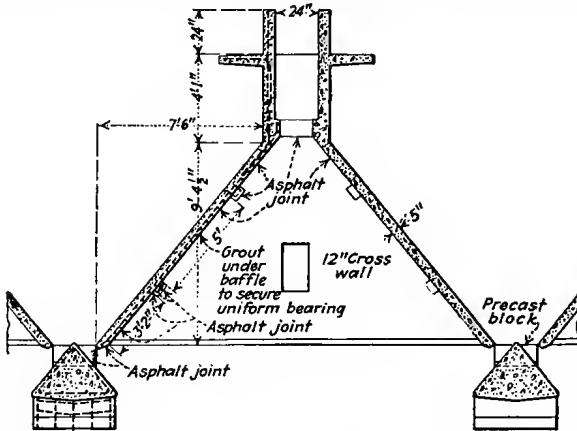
Precast-slab baffle walls in Imhoff tanks at West Side treatment plant, Chicago.
